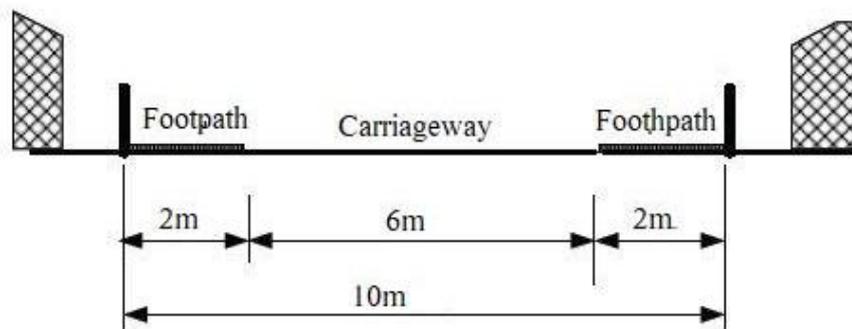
Typical Cross-section for Class B Roads (with RoW 10 m)
